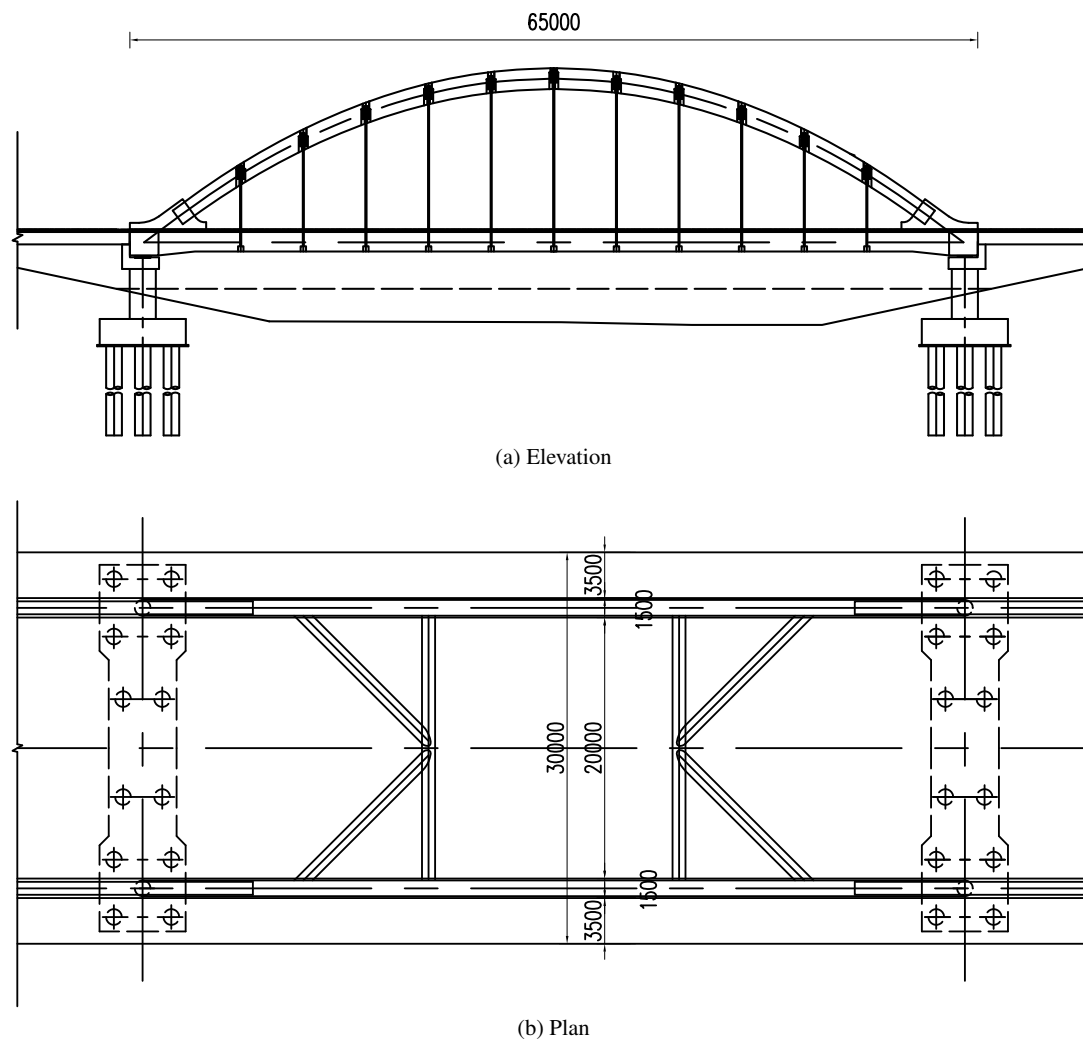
Configuration of the CFST arch bridge (unit: mm).
